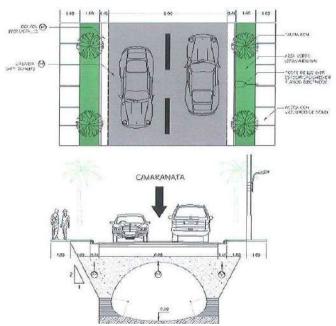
View in Plan and Cross Section of the Proposed Roads
